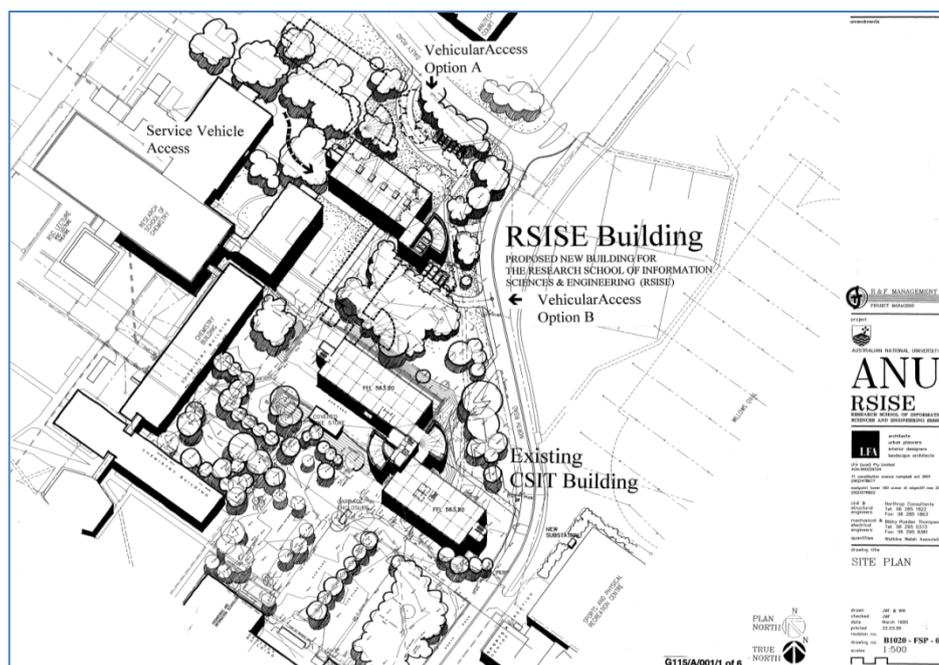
Site Plan of the CSIT and RSISE Buildings in relation to each other and the campus, March 1995 (Source: ANU Drawing Office)
